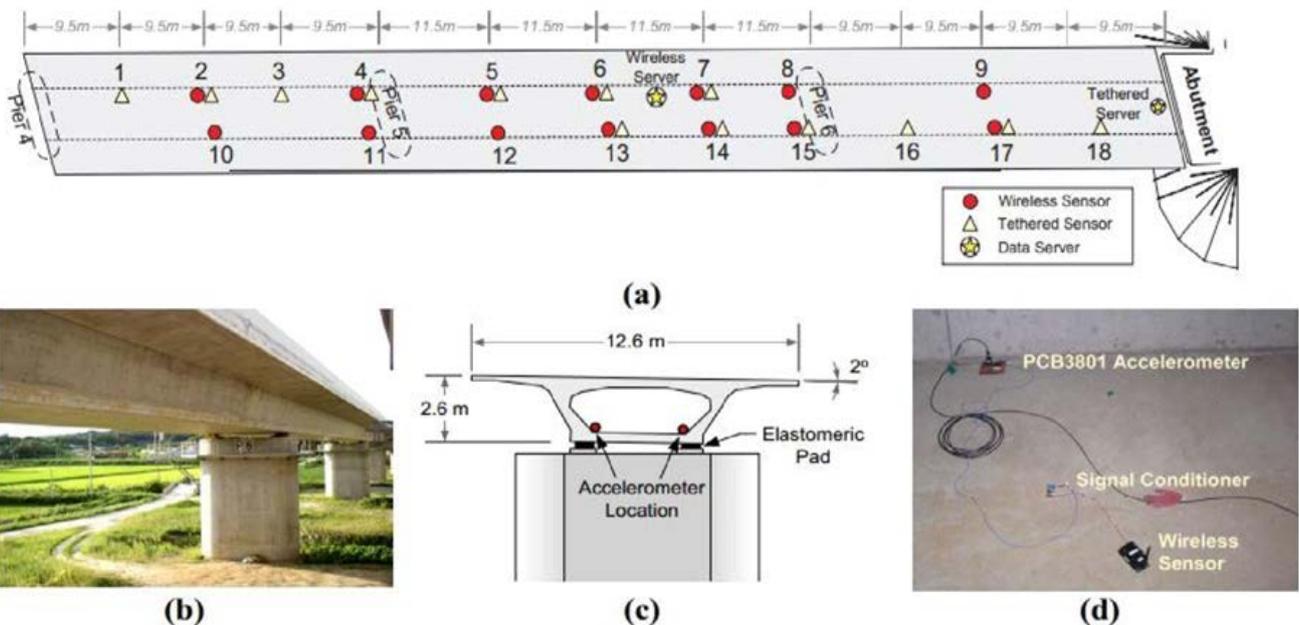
(a) Location of wireless sensors installed along the length of the Geumdang Bridge; (b) External view of the box girder bridge; (c) Cross-section of the box girder showing the location of accelerometer location; (d) Typical wireless sensor-accelerometer installation [21]
